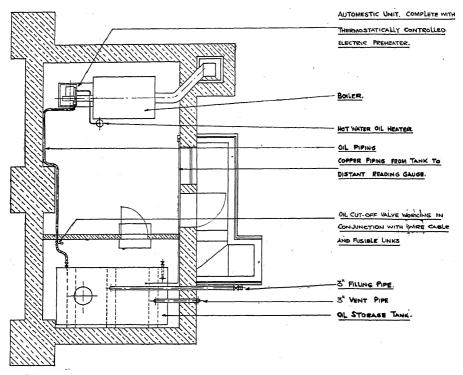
LAYOUT OF AUTOMATIC OIL-BURNING EQUIPMENT FOR A HEATING BOILER Designed to burn heavy fuel oil. Scale: $\frac{1}{4}$ in. = 1 ft.
